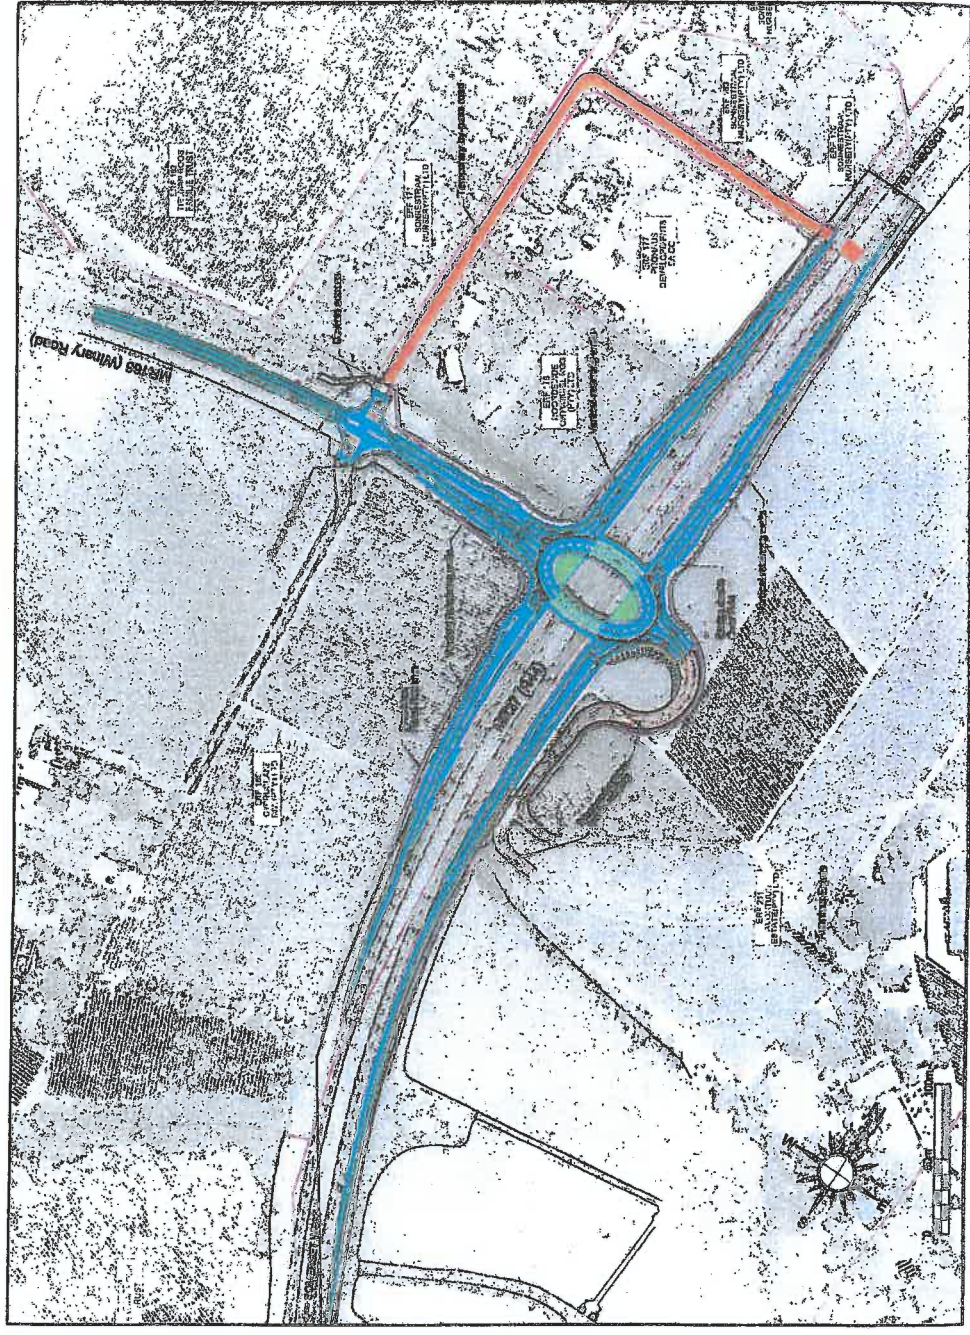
Proposed grade separated roundabout at the Winery Road Intersection with vertical retaining walls (K&T, September 2014)
